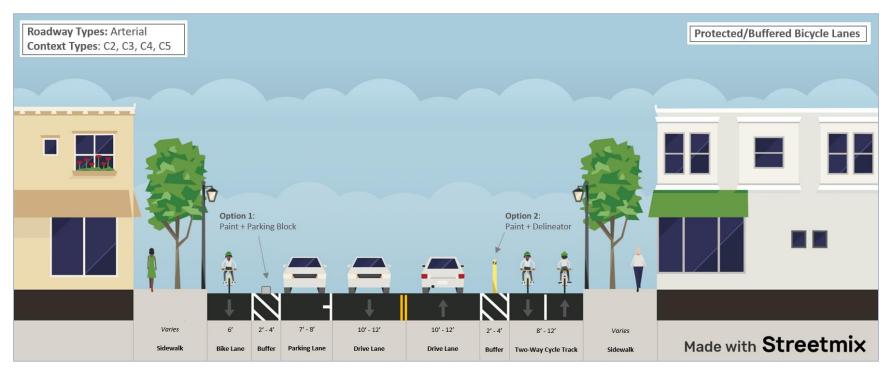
Typical Section 6 - Dedicated Bicycle Lanes
